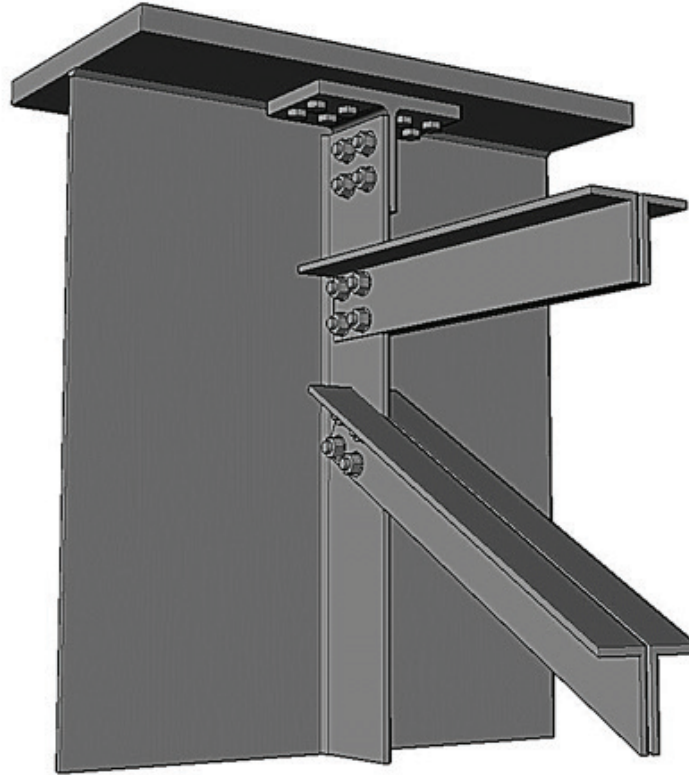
Completed bolted splice retrofit showing WT stiffener attachment element (AASHTO/NSBA G14.1)
